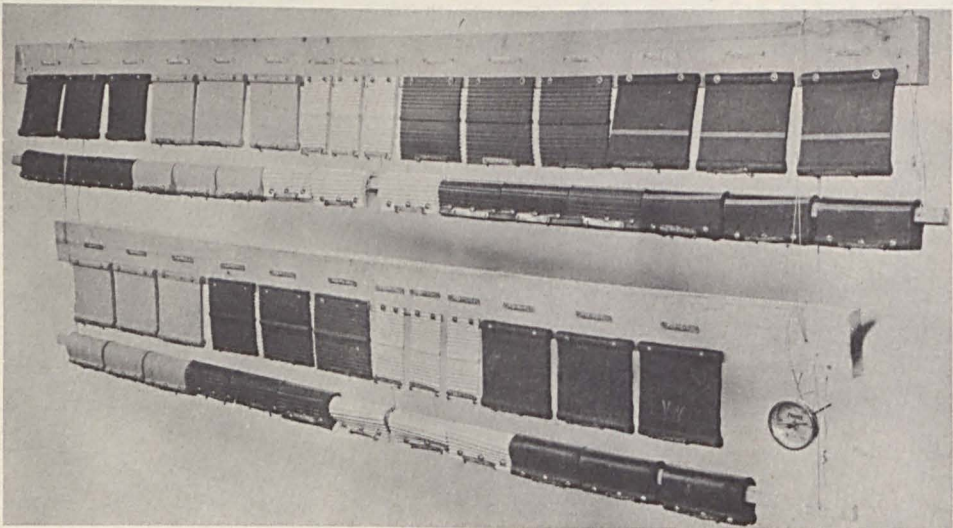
Waterstop specimens, both stressed and unstressed, stored inside at Jackson, Miss.
